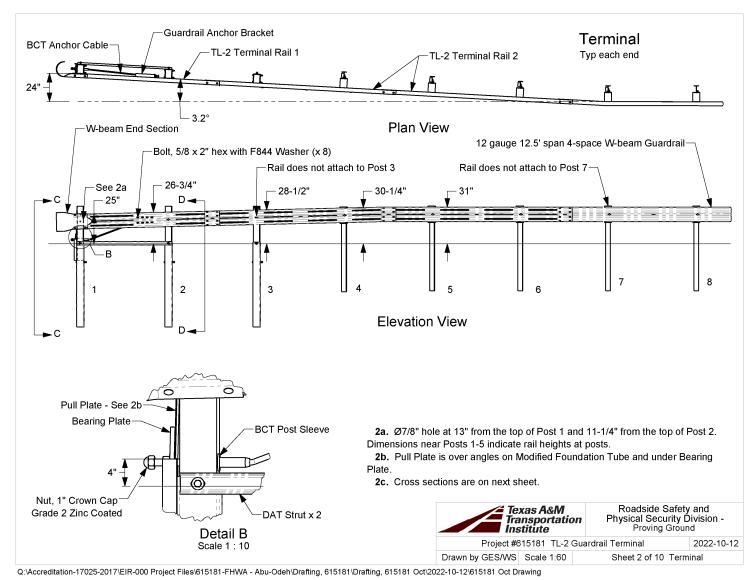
Details of TL-2 W-beam End Terminal Test 615181-01-13.
